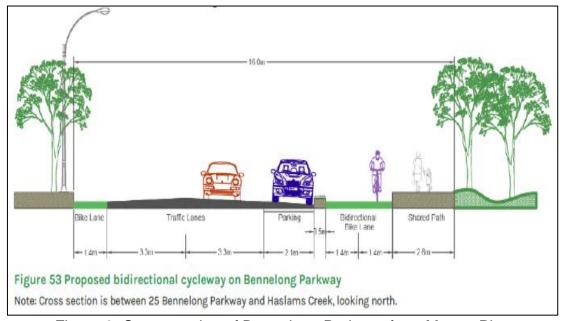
Cross-section of Bennelong Parkway from Master Plan
